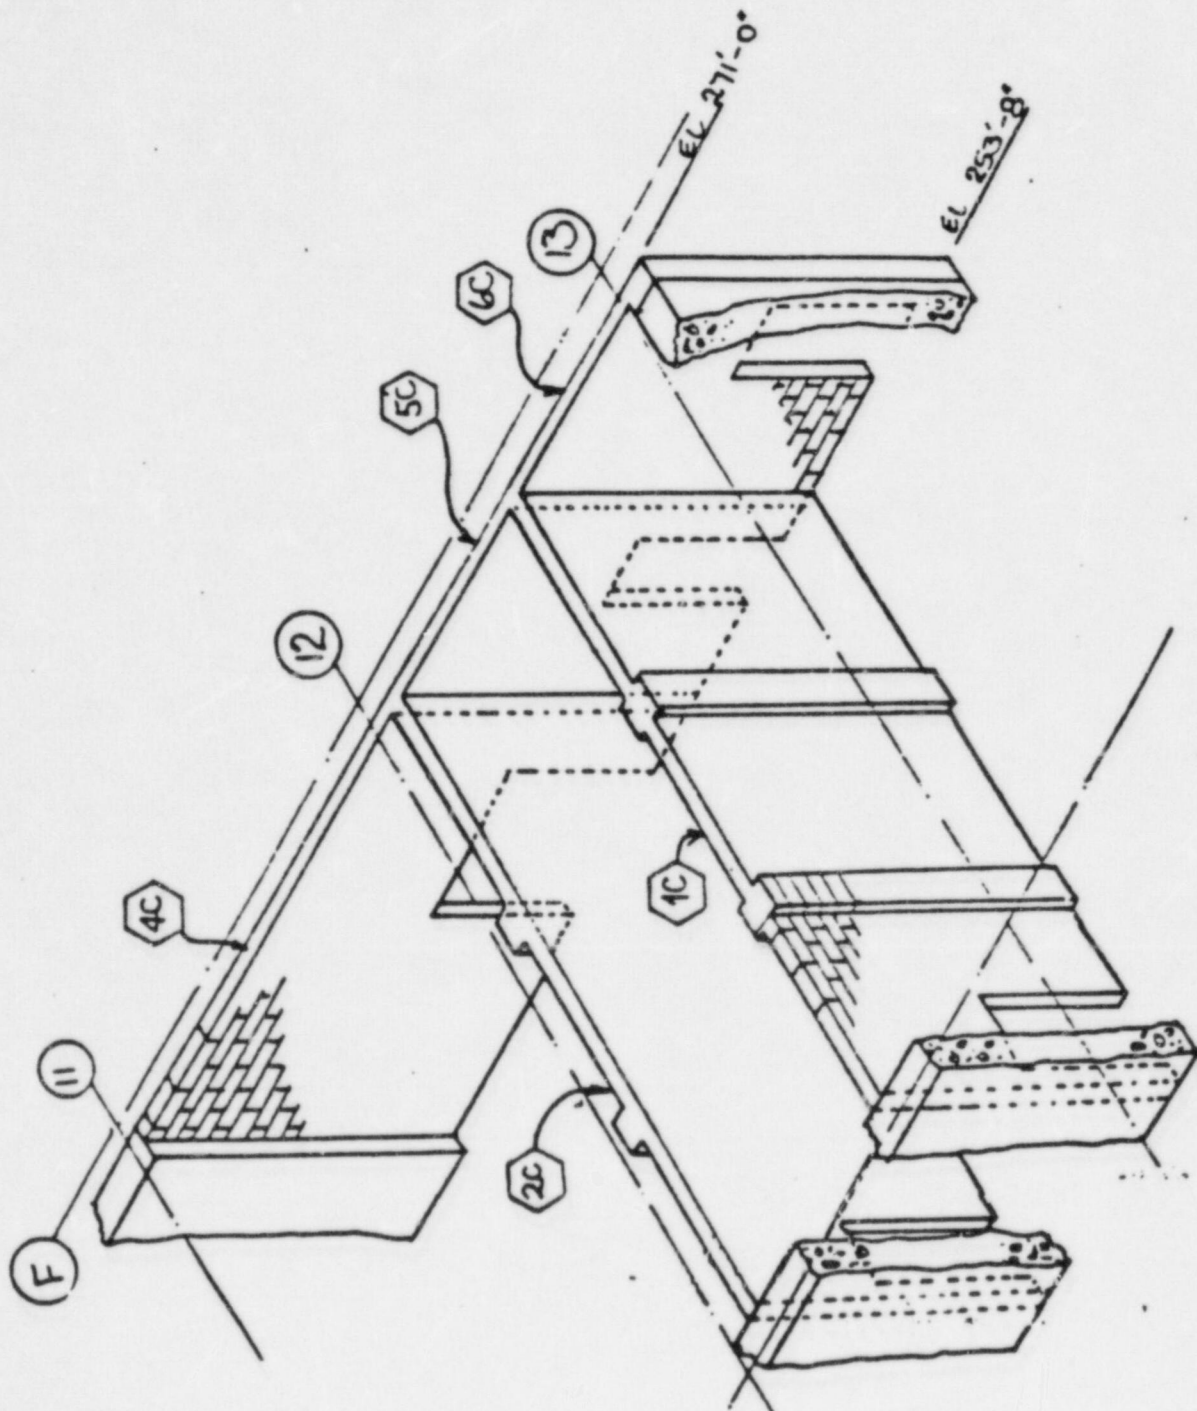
Control Building Walls Elevation 253 feet, 8 inches
